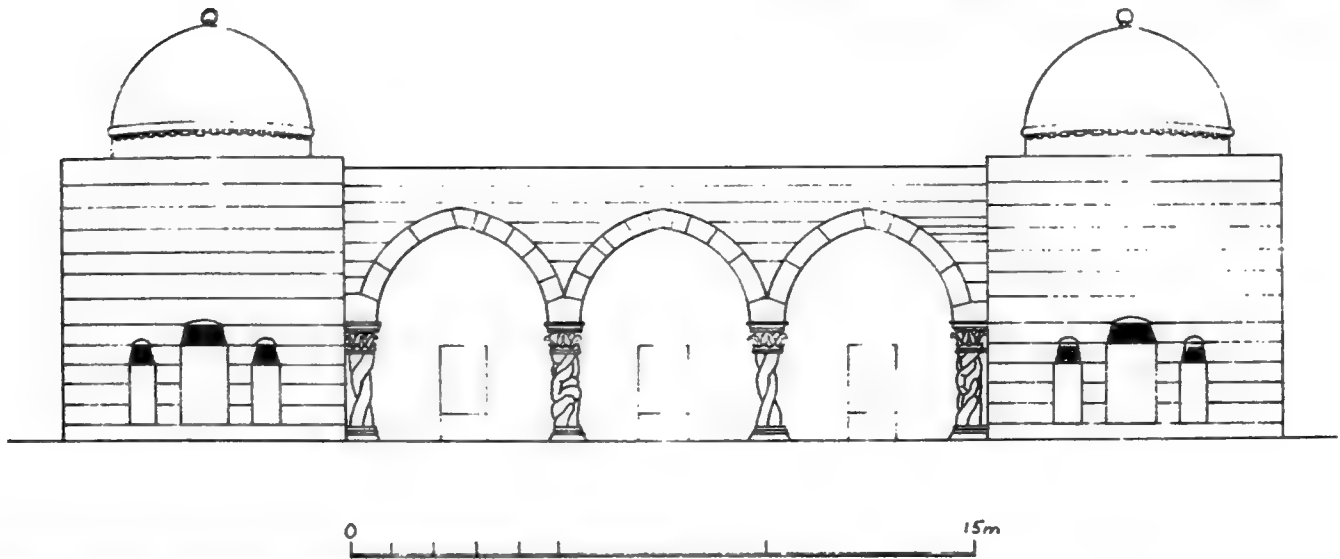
Madrasa al-Nahawiyya, sketch reconstruction of the north façade (first phase)..
